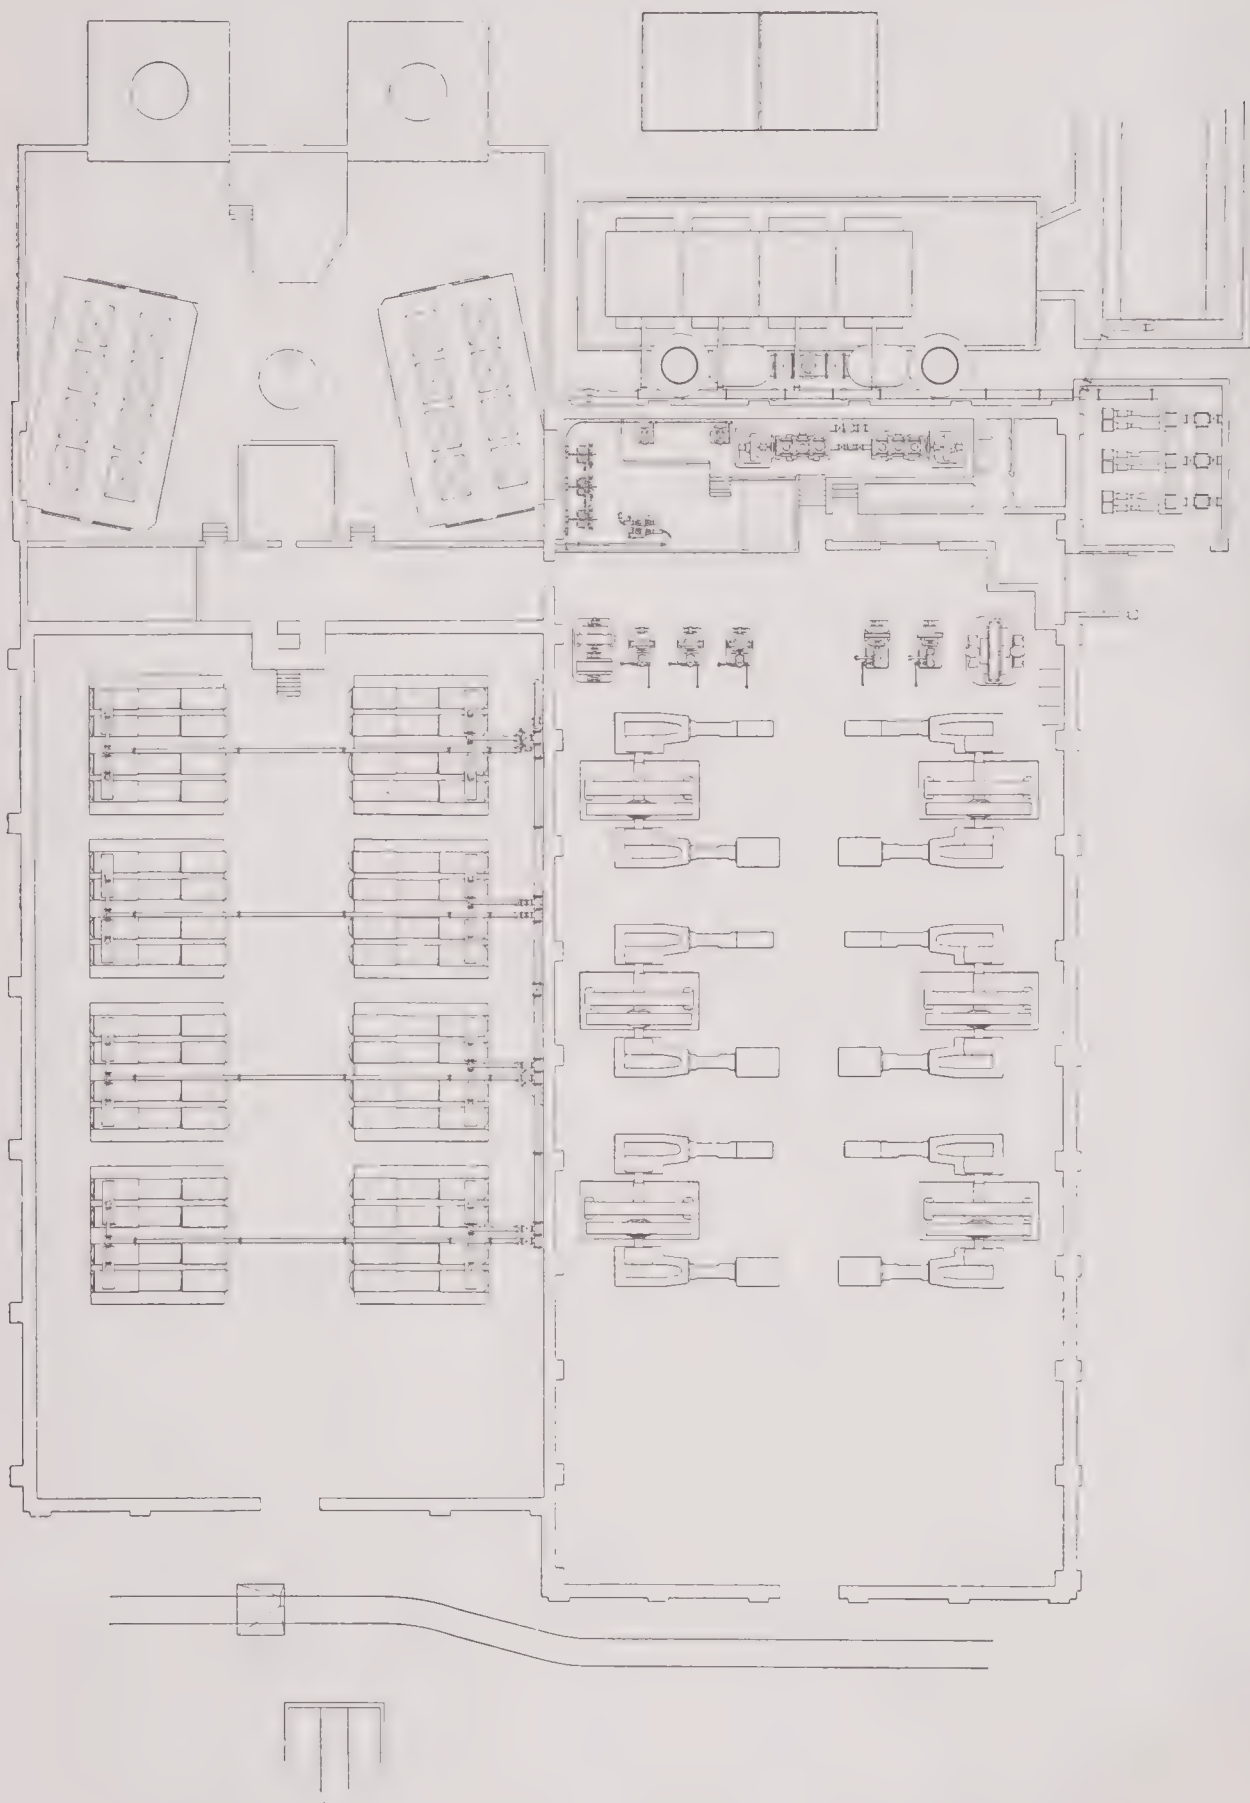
CENTRAL LONDON RAILWAY: PLAN OF POWER STATION.
